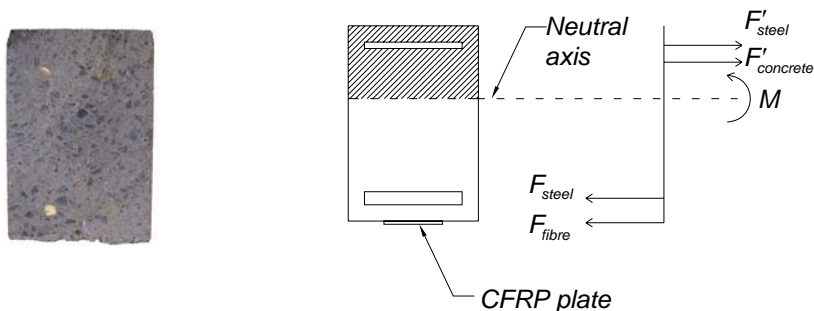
Forces acting on a CFRP strengthened concrete beam cross-section subjected to a moment, M .
